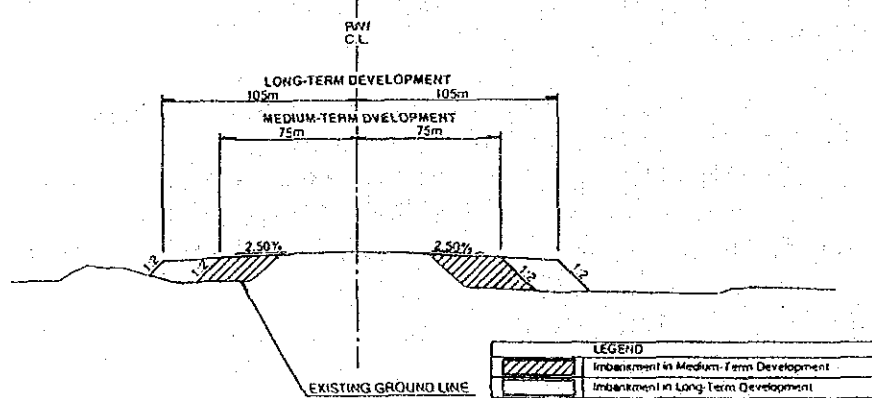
Phasing Plan for Grading of Runway Strip
